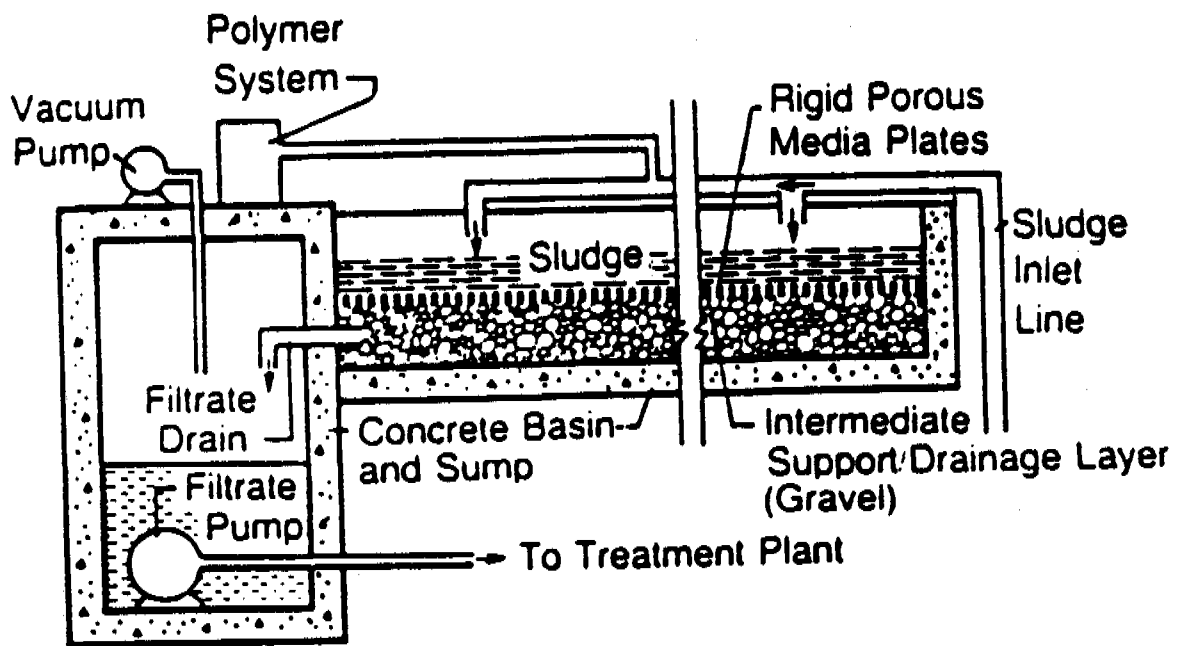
Vacuum Assisted Sludge Dewatering Bed Cross Section.
